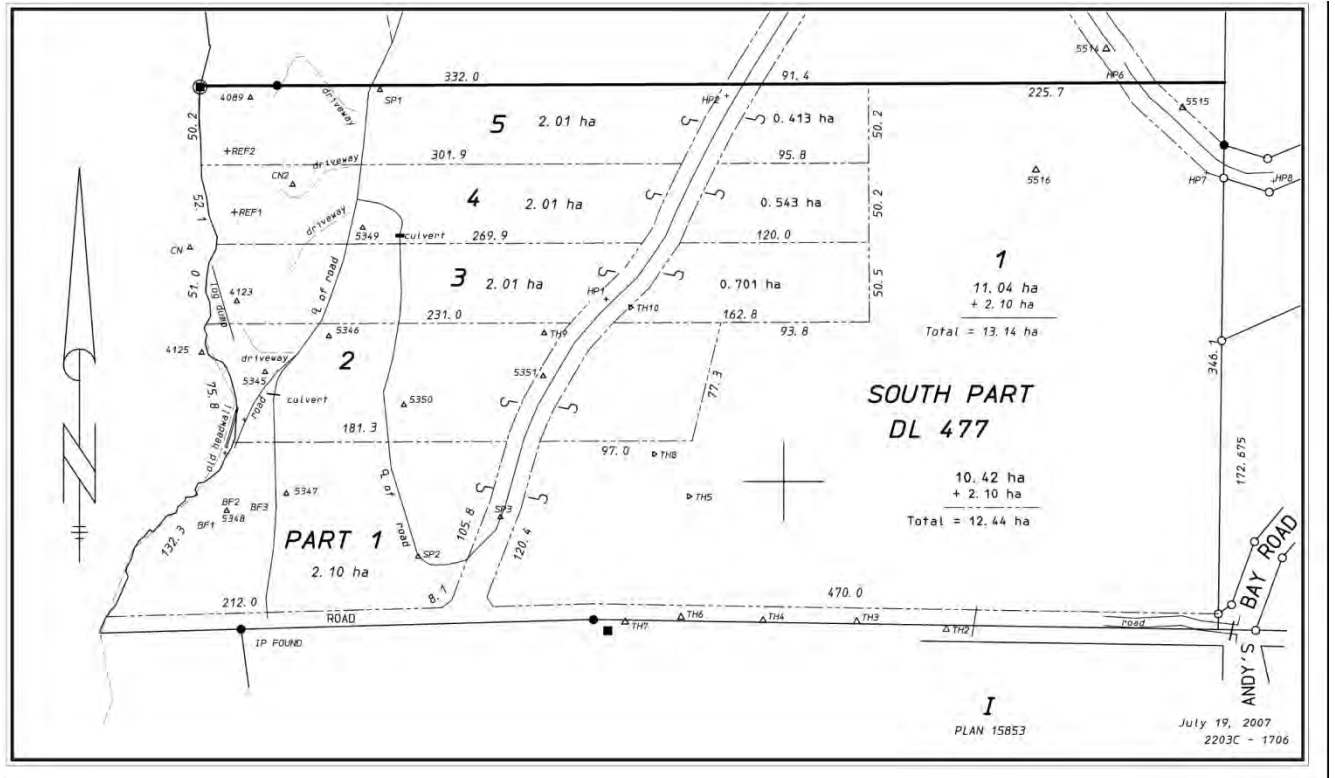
Survey plan dated July 19, 2007 showing the centre line of previously existing roads and the location of the old timber headwall.
